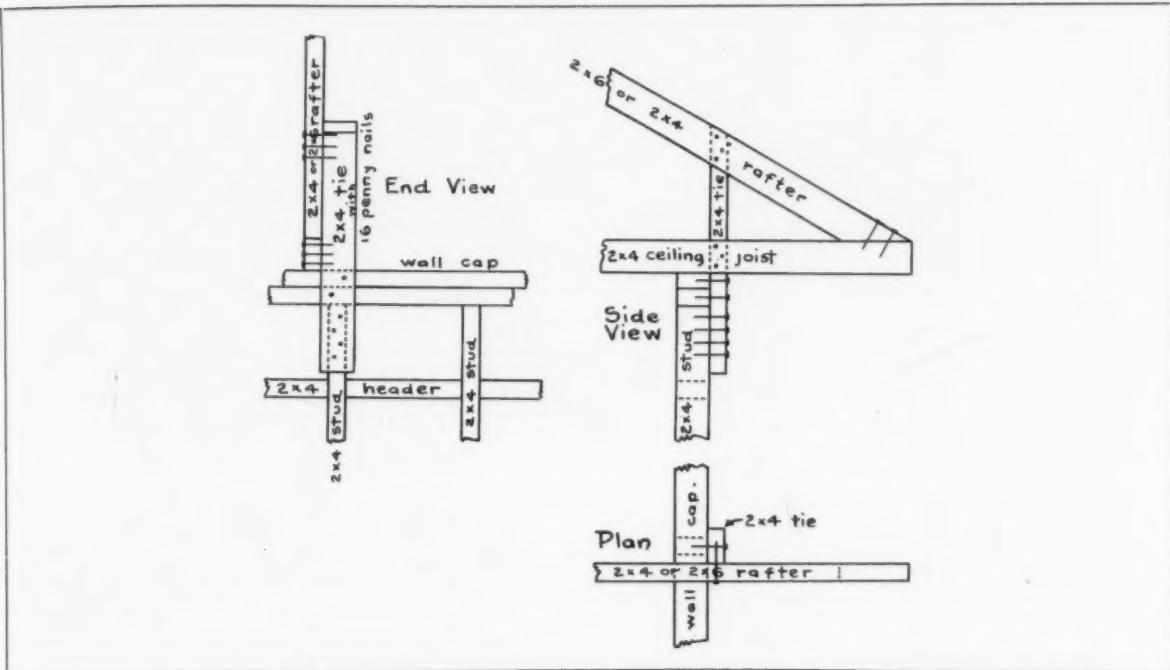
Another Method of Anchoring the Roof to the Exterior Walls
